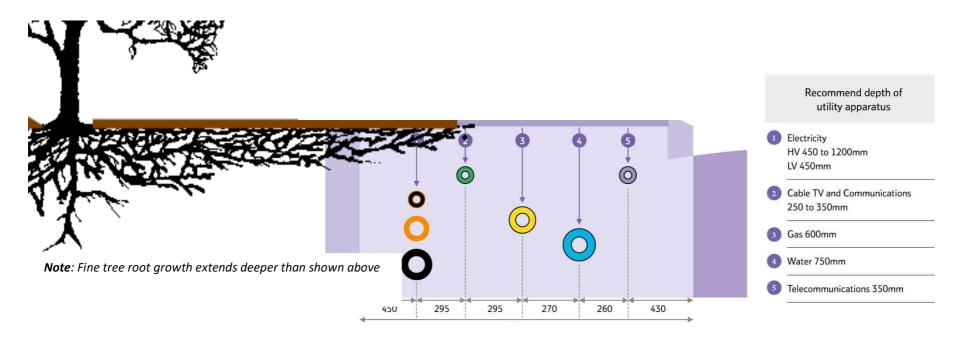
Annotated service installation depth drawing (source: Thorne & Derrick). Service installations occupy the same soil volume/ depth where the greatest level of tree roots will likely be found.
